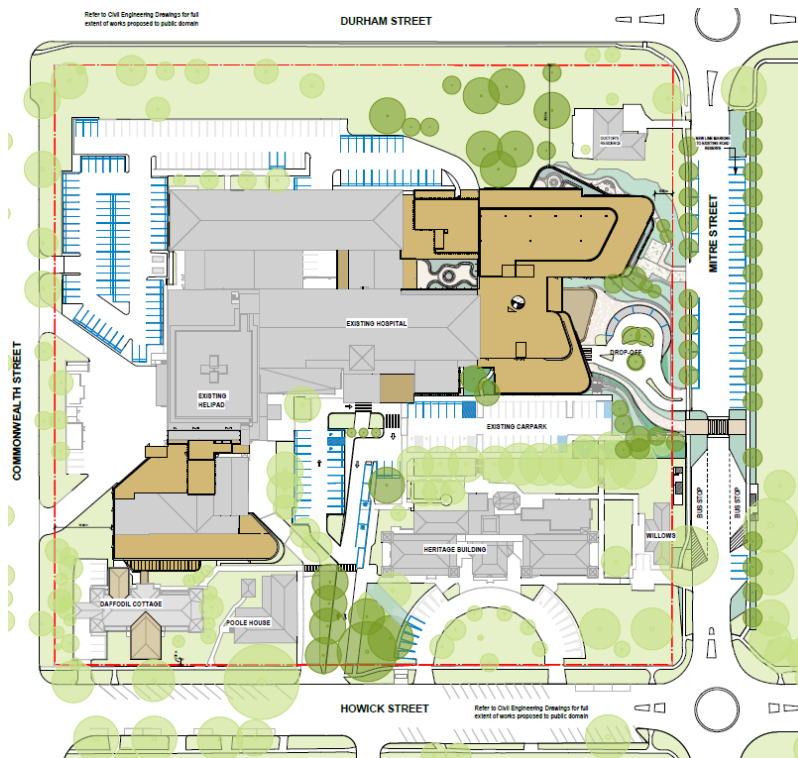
The site context plan post construction (courtesy: Billard Leece Partnership, 2025)
